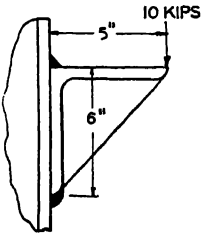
Bracket Held by Fillet Welds.
